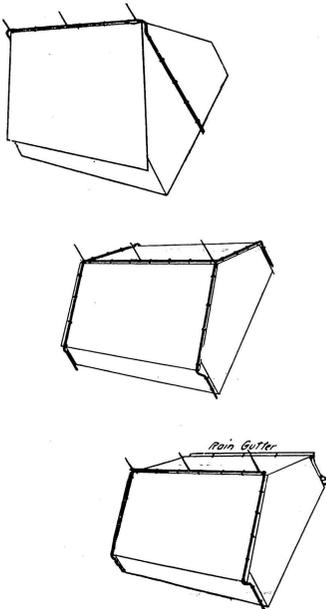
A steep roofed building needs no conductors at the eaves. If the roof is flat, the eaves need protection, especially at the corners. The rain gutters may be sufficient protection for the eaves.
